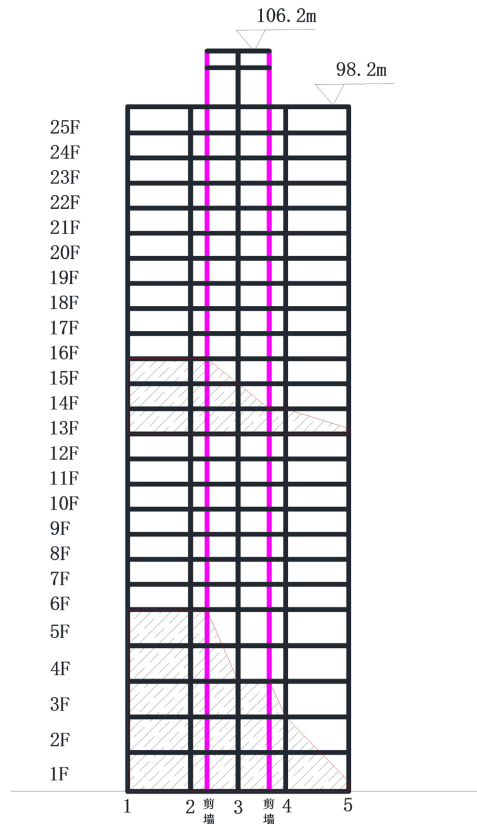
Elevation and blasting cut layout of T1 and T2 buildings
